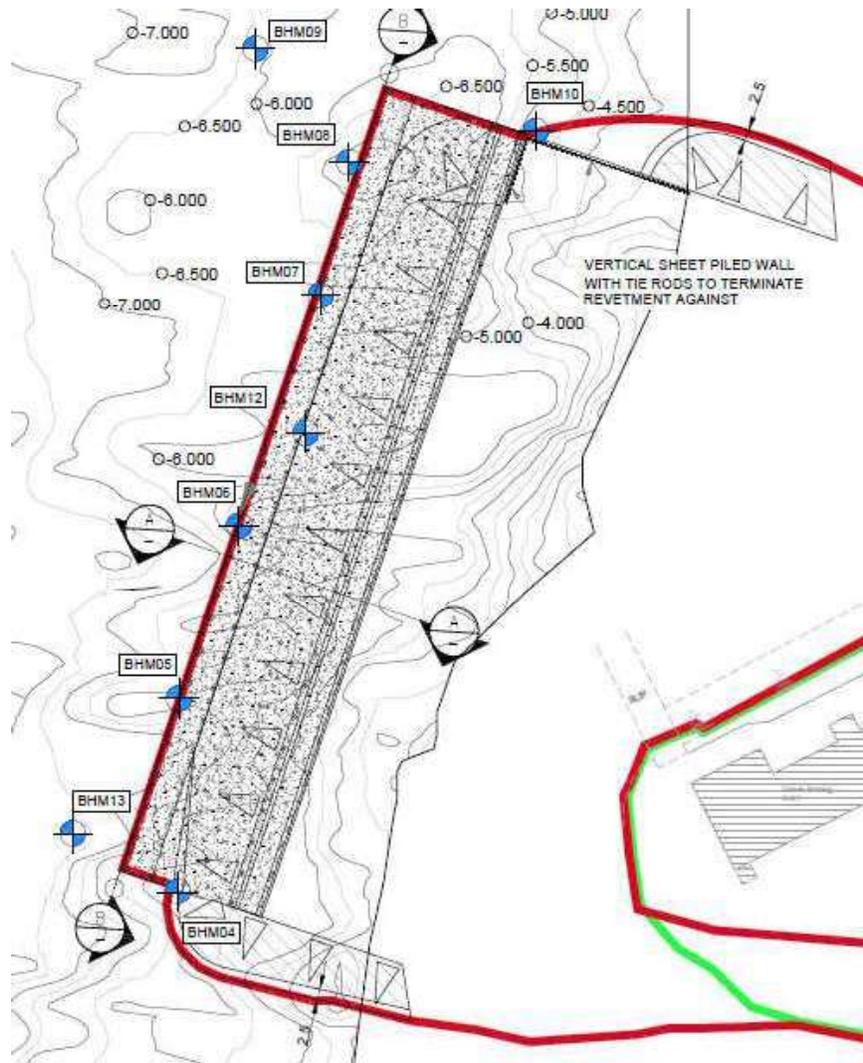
Plan Arrangement of Open Piled Quay Wall
